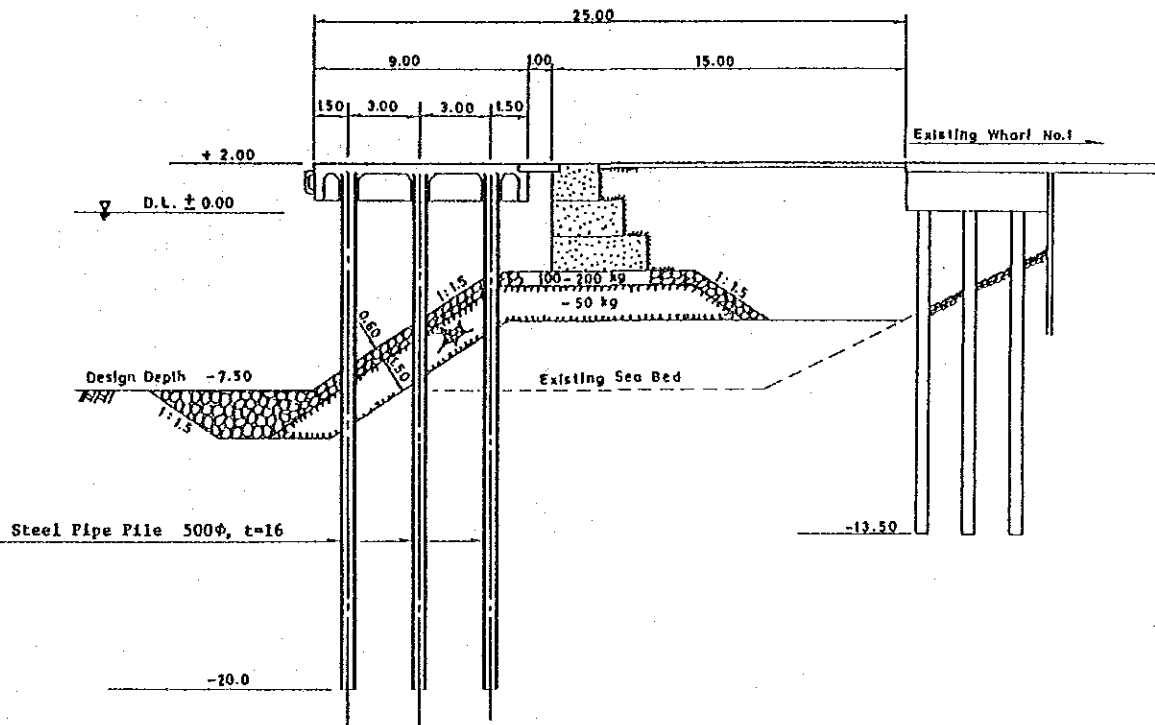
(2) Standard Cross Section of Wharf E-2 (Unit:m)
